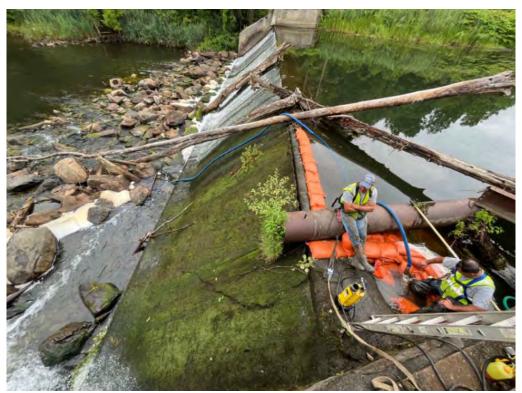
Temporary sandbag cofferdam installed. Installing dewatering pumps.
